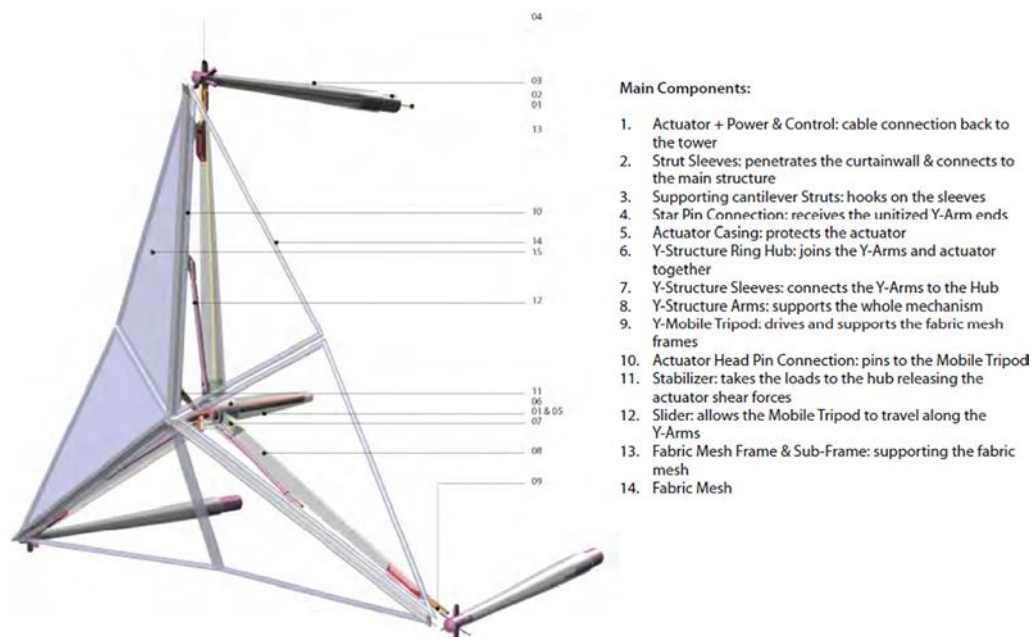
Detailed 3D model of Al Bahr Tower facade Shading Component. (Source: Shahin 2018)
